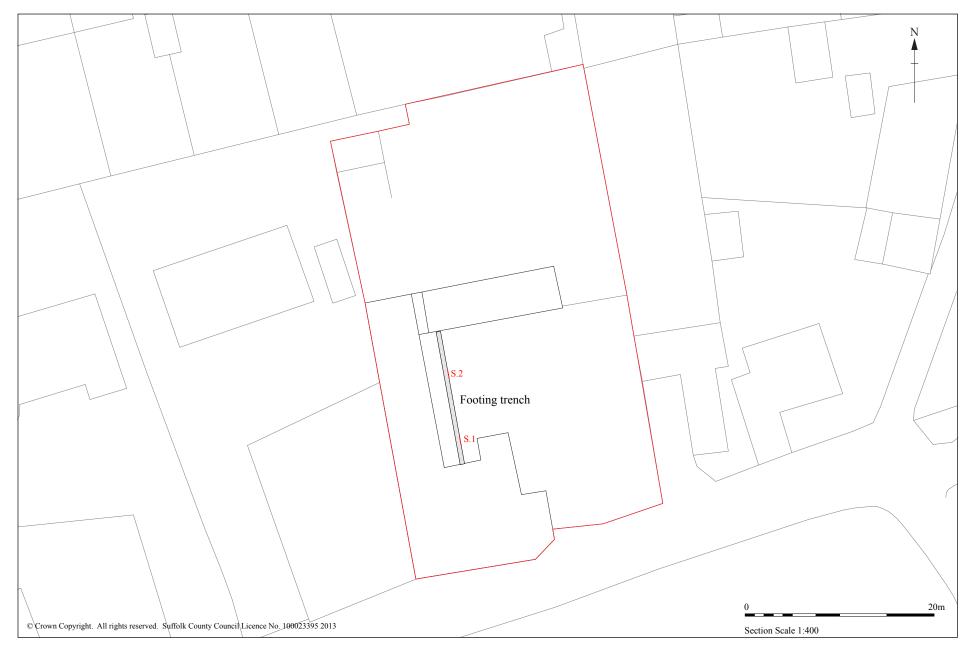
Plan showing the location of the monitored footing trench and location of sections
